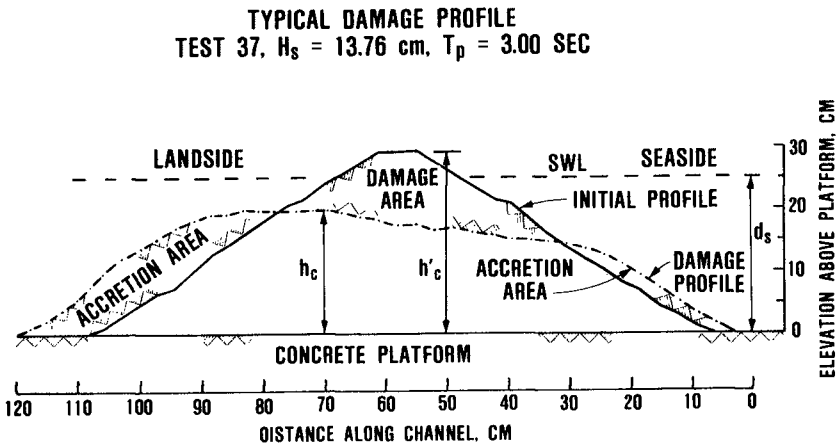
Cross sectional view of the initial and damaged breakwater profile.
